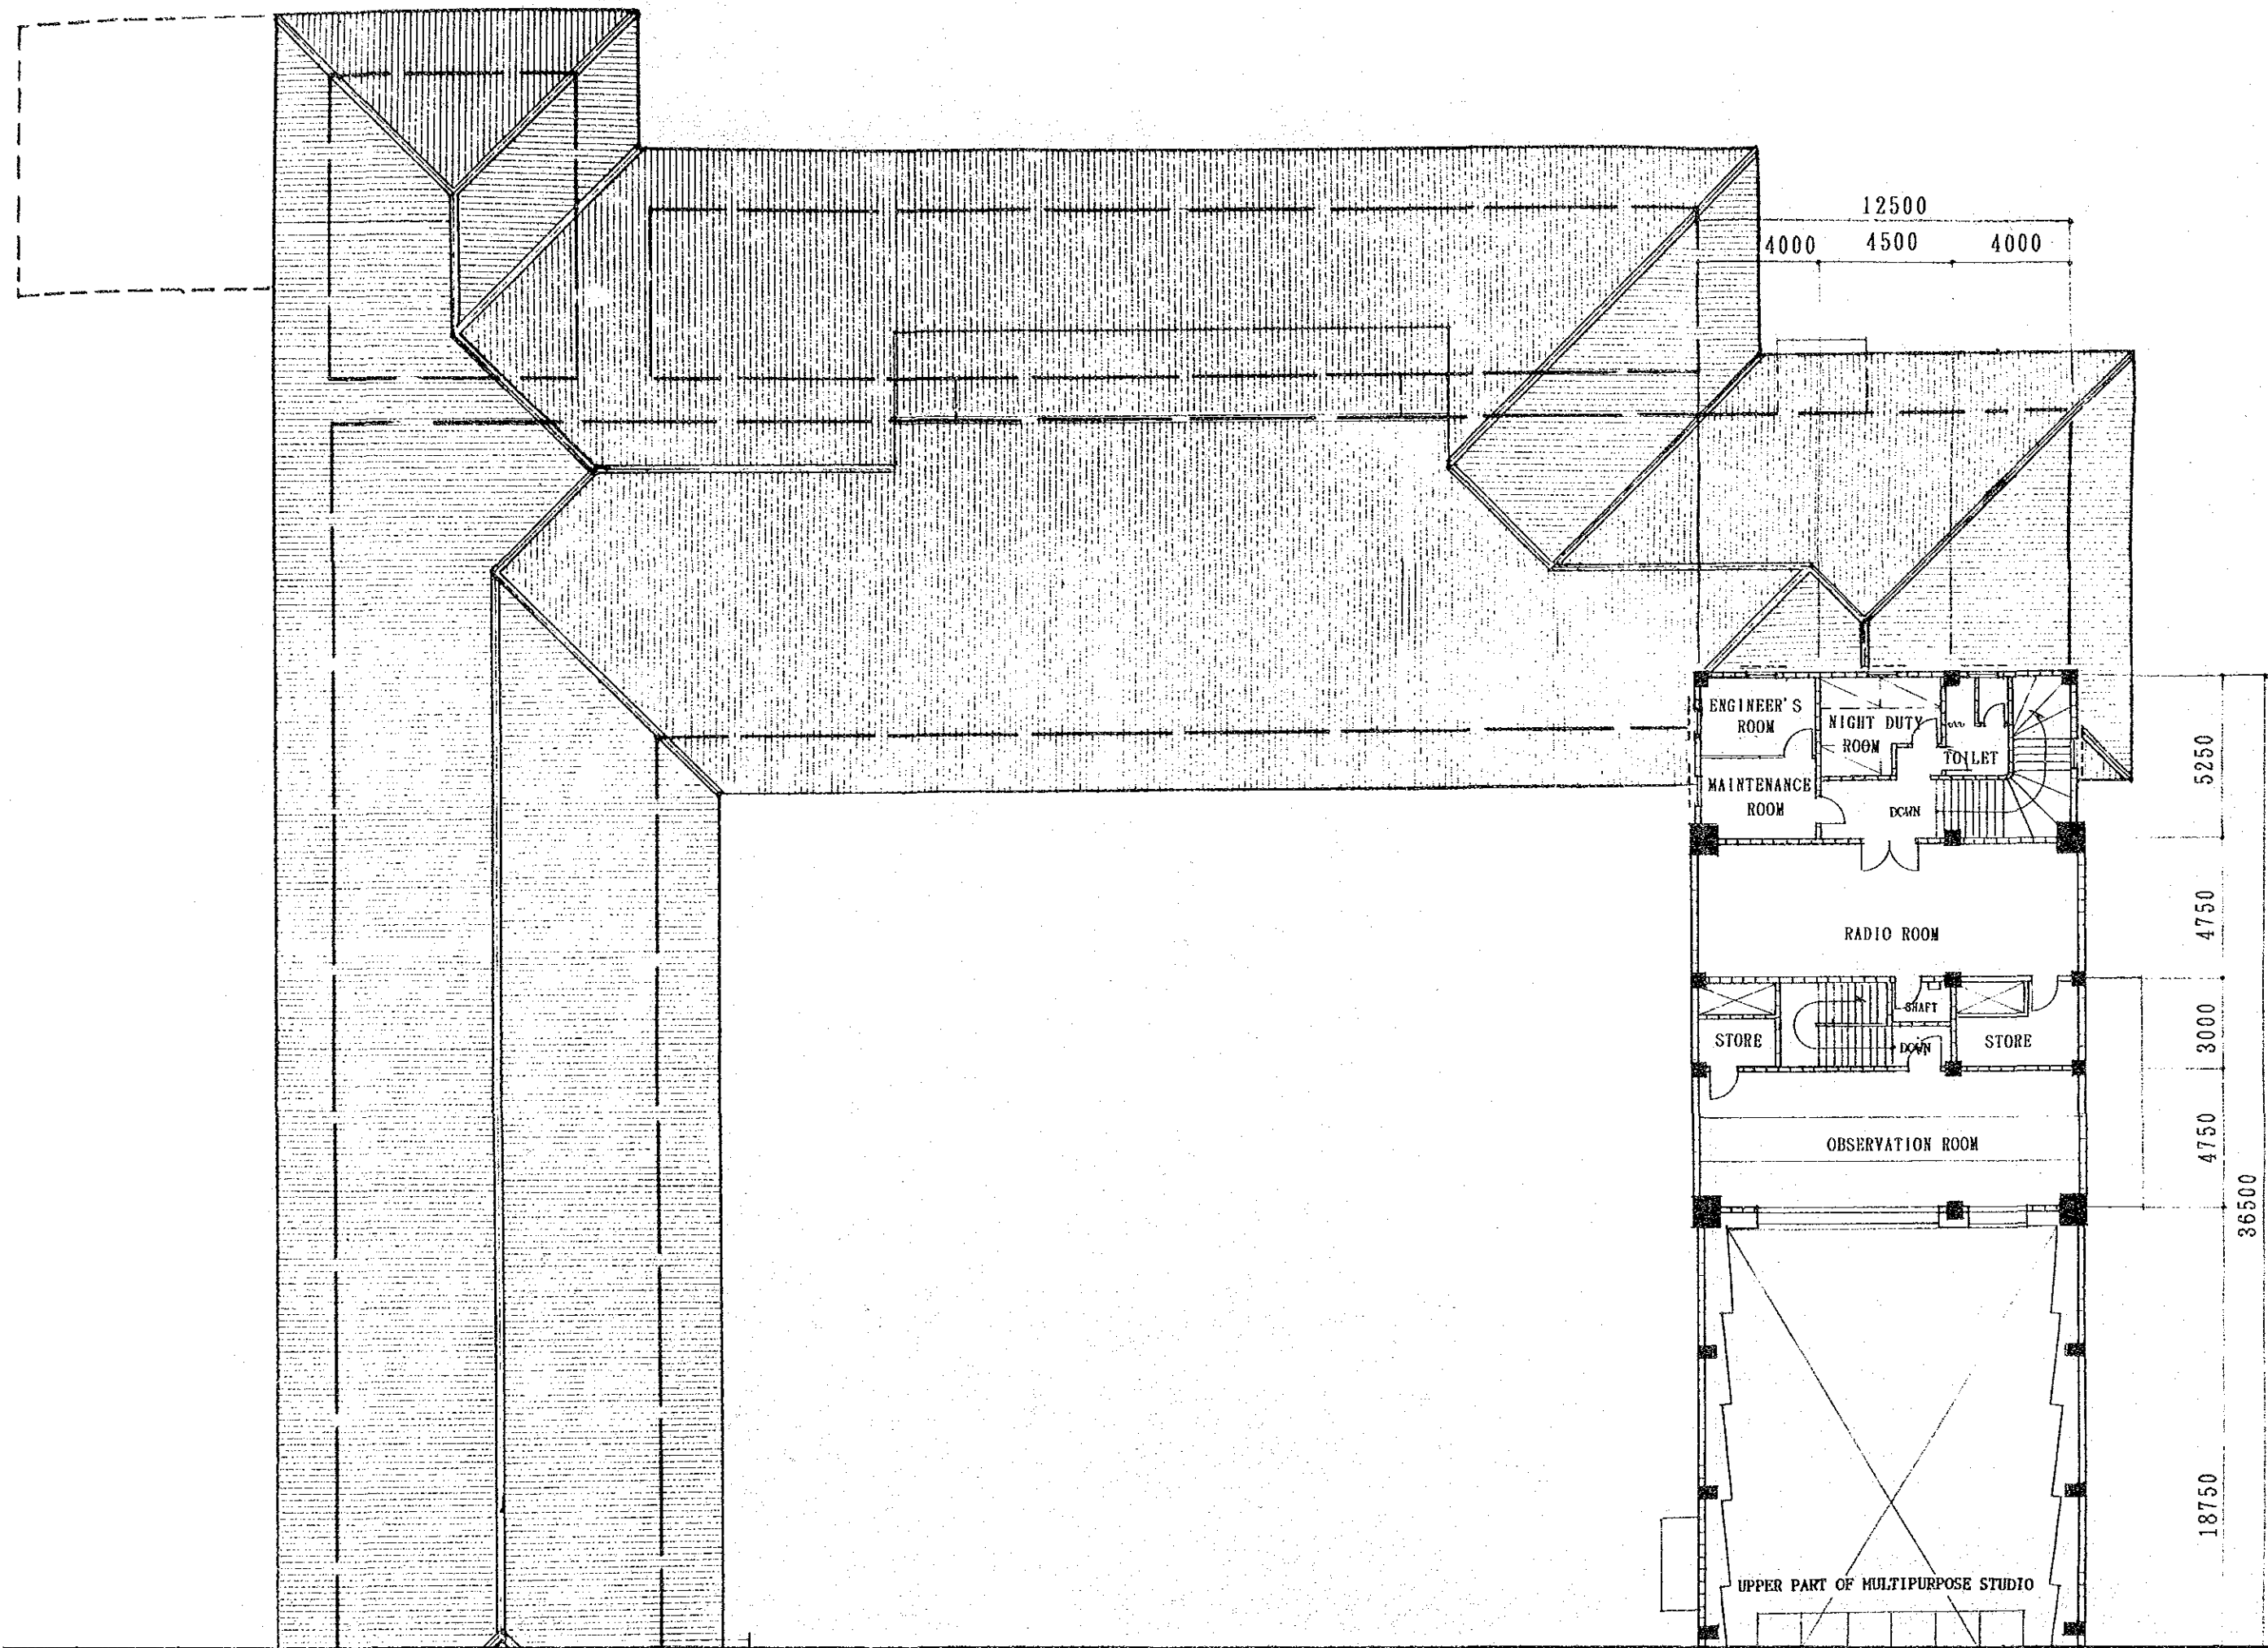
1 - 2 SLBC NEW STUDIO BUILDING
